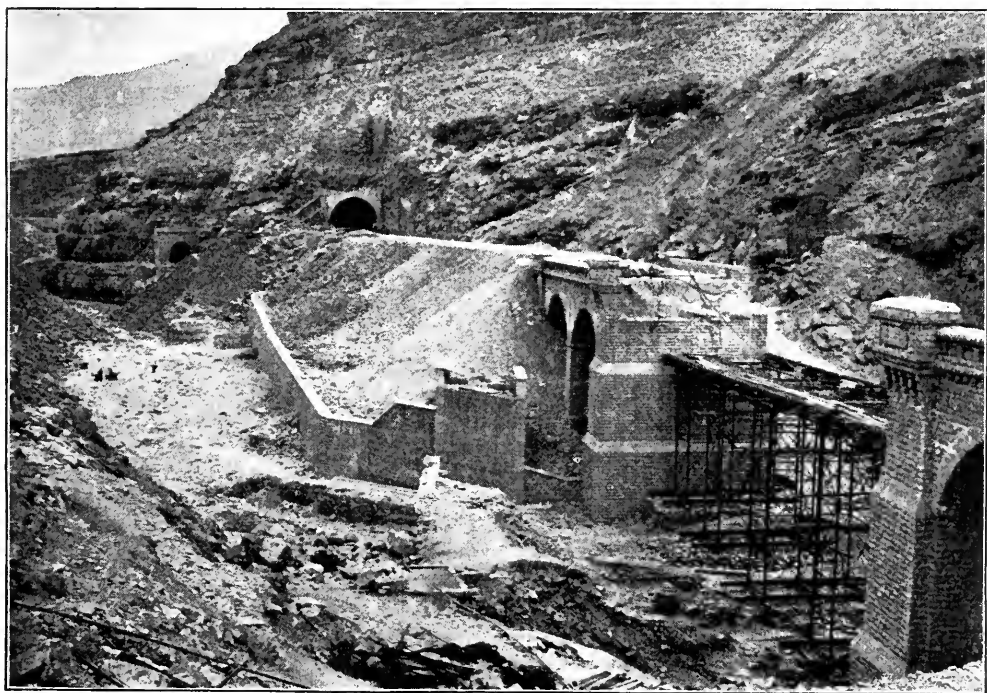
BRIDGE IN BOULAN PASS., MUSKAF BOULAN RY., BELOOCHISTAN.
